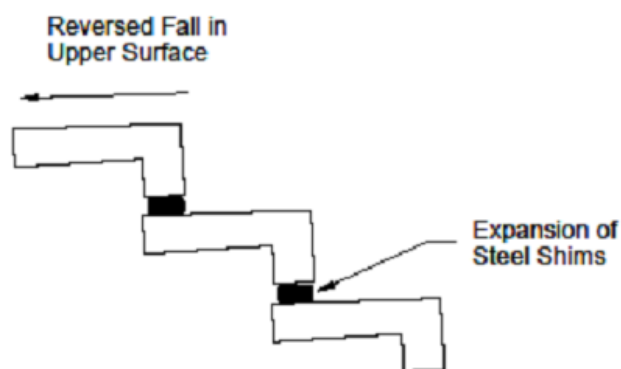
b Cross-section through precast concrete steps after expansion of steel shims.
